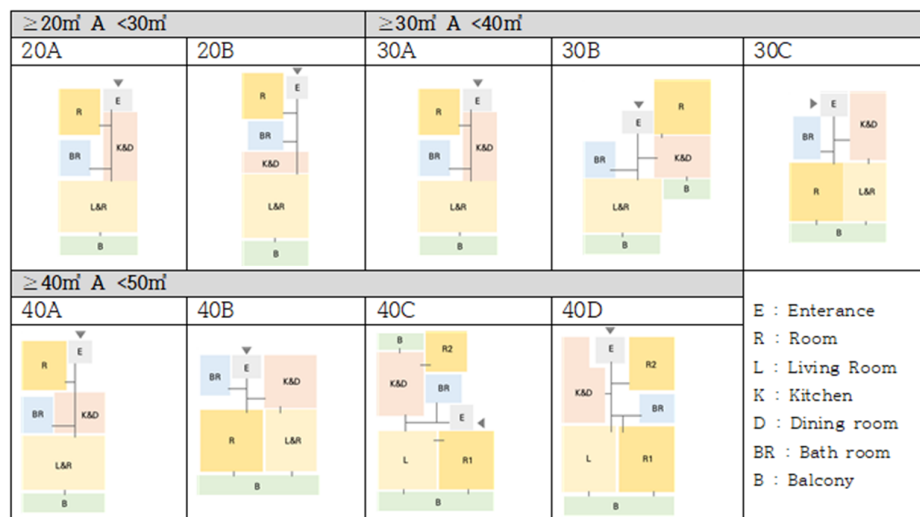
Types of spatial layout in public rental housing floor plans in the 1990s.
